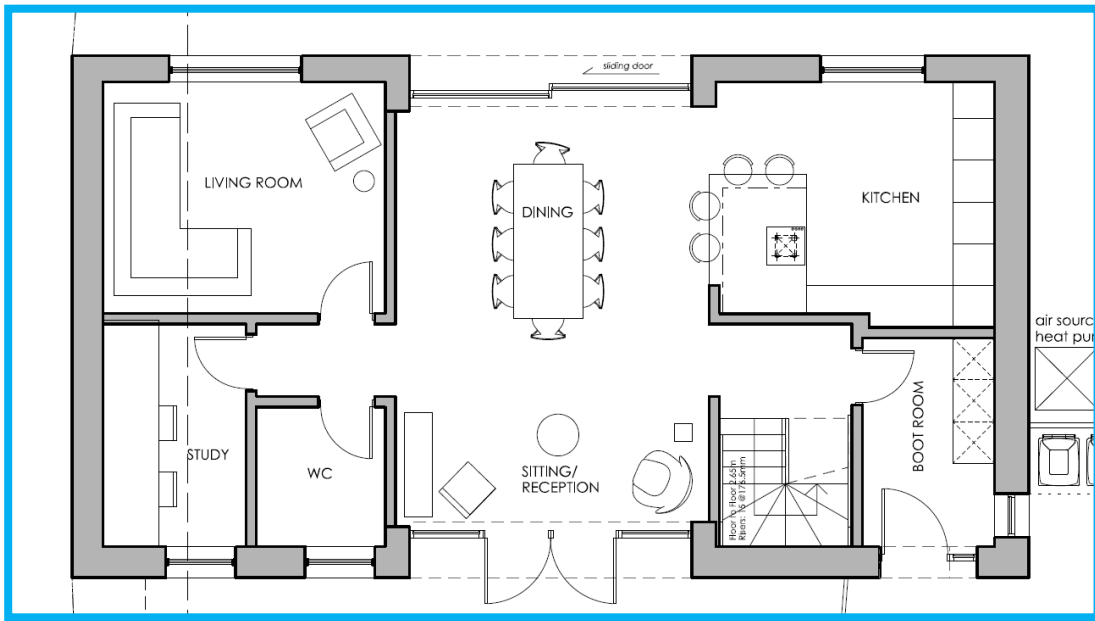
Proposed ground floor with general living accommodation (Mitchel Eley Gould).
